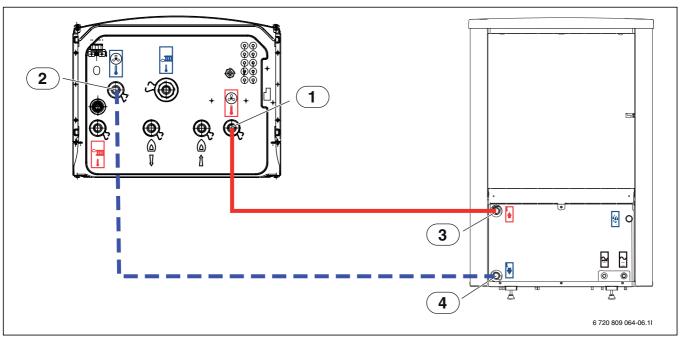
Connection of the heat pump module with mixing valve for external booster heater to the heat pump
